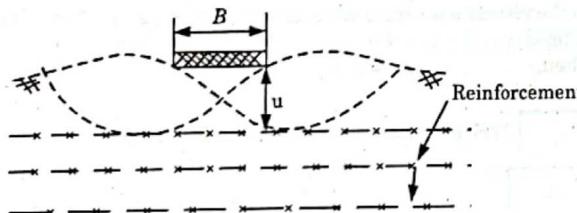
Bearing capacity failure above upper reinforcement layer.
